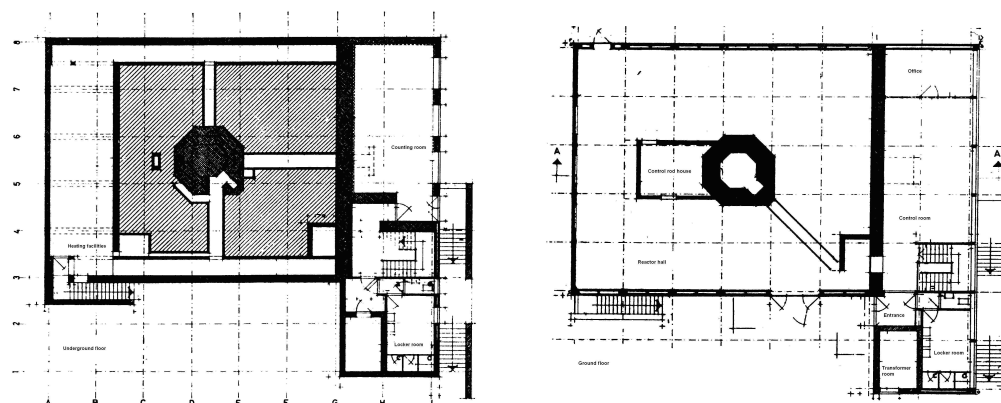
Horizontal section of the underground floor and ground floor of the building.
